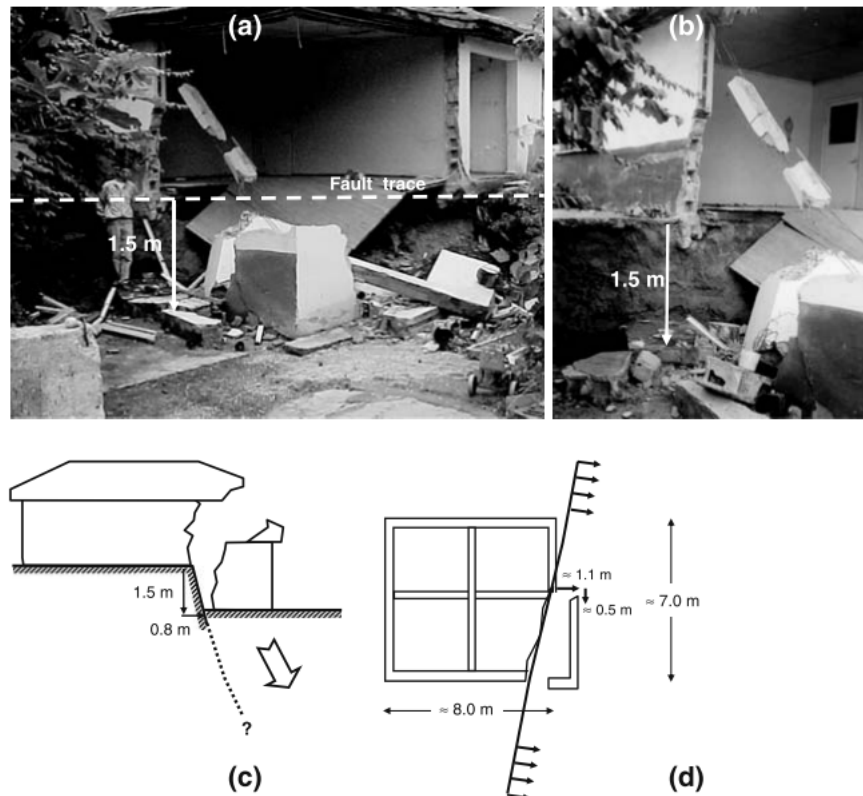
Building 2 partial collapse. Photos, schematic cross section and plan view, (Anastasopoulos and Gazetas [2007a]).
